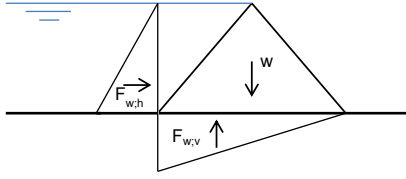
Typical loads on a schematized temporary water-retaining structure consisting of layers of sand bags.
